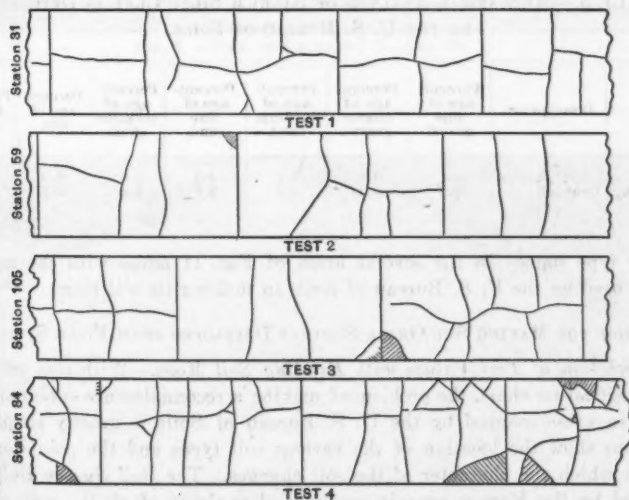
TYPICAL CONDITION CHARTS OF CONCRETE PAVEMENT AT THE SEVERAL TEST SECTIONS.
